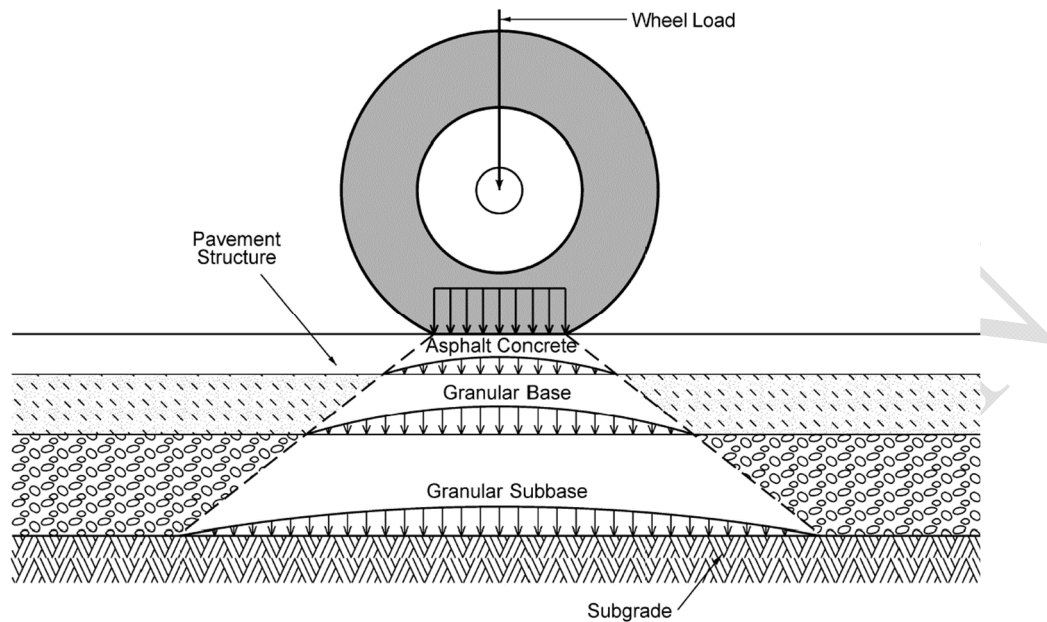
Distribution of Wheel Load through Pavement Structure (not to scale) (Adopted from Asphalt Institute 2007)
